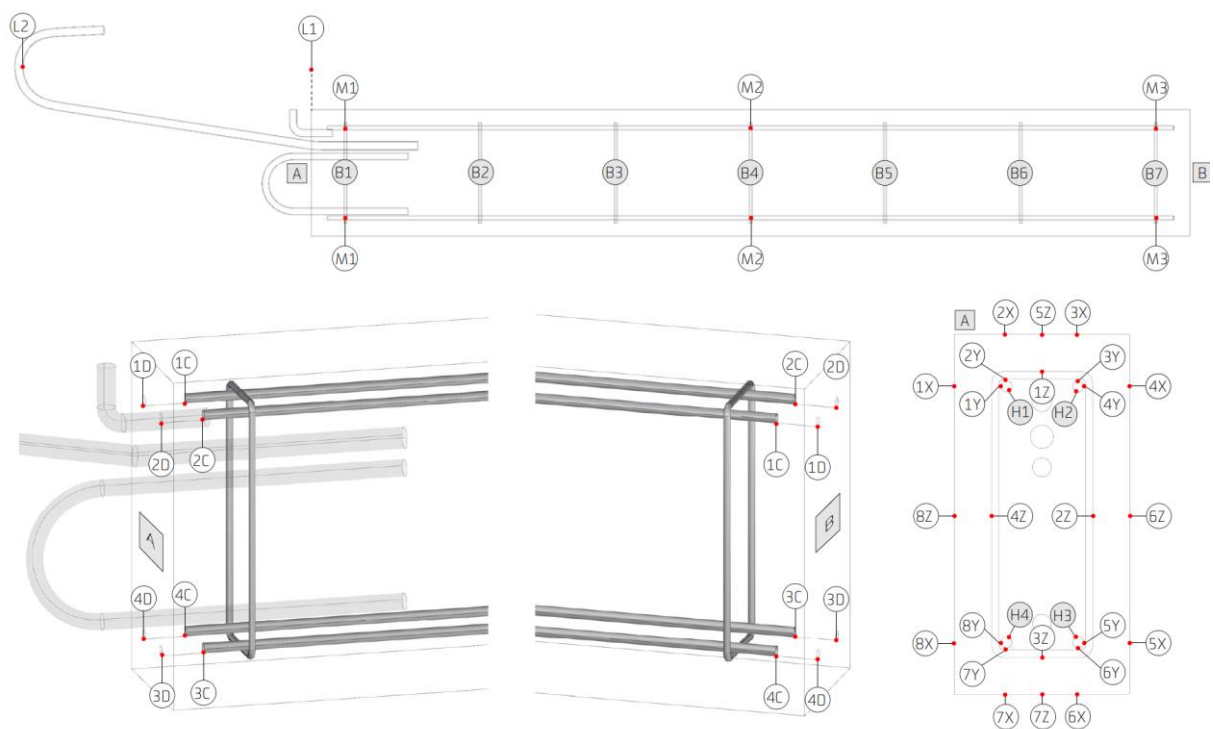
Drawing defining points on the inside of the formwork and on the outside of the reinforcement used to document the cover to reinforcement prior to casting of the concrete elements. Two extra stirrups are added to the instrumented concrete elements as shown in Figure 2.5. Therefore, the stirrups in the instrumented elements are numbered B1 to B9 shown from left to right in Figure 2.5.
